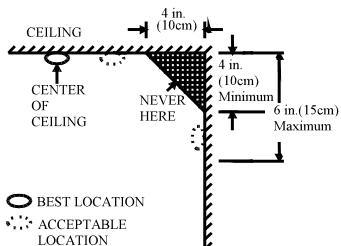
Recommendations for best and acceptable installation locations for installing smoke / heat detectors.
